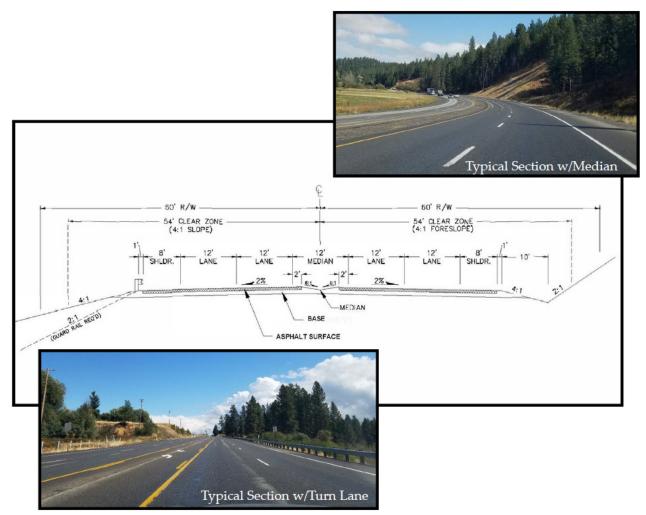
Bigelow Gulch Road arterial upgrade cross-section
